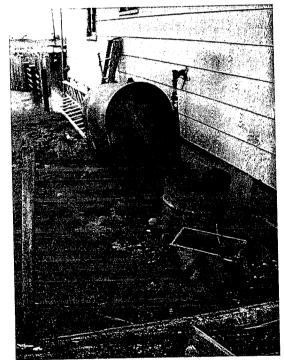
Heating oil tank observed adjacent to southern wall of northern house. Tank appeared to be in good condition.
